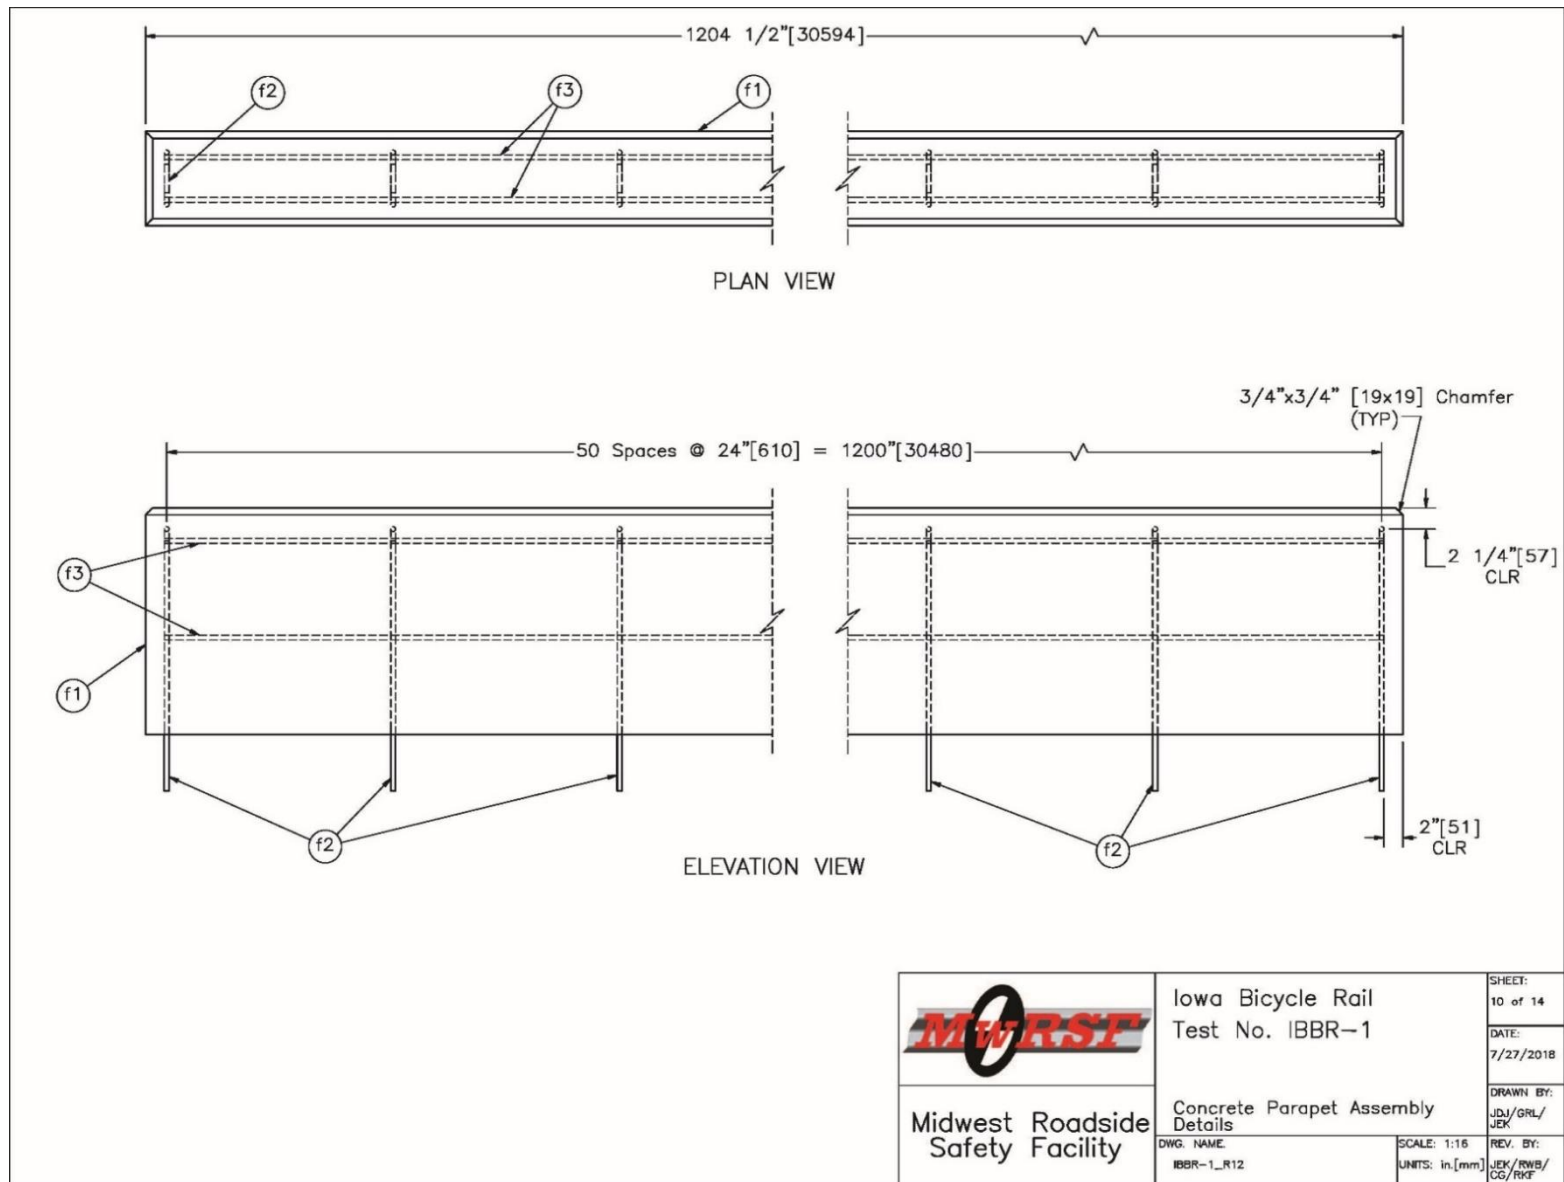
Iowa Bicycle Rail – Concrete Parapet Assembly Details
